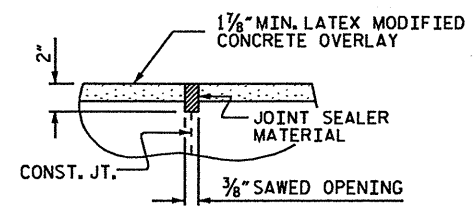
DETAIL FOR LATEX MODIFIED CONCRETE OVERLAY
